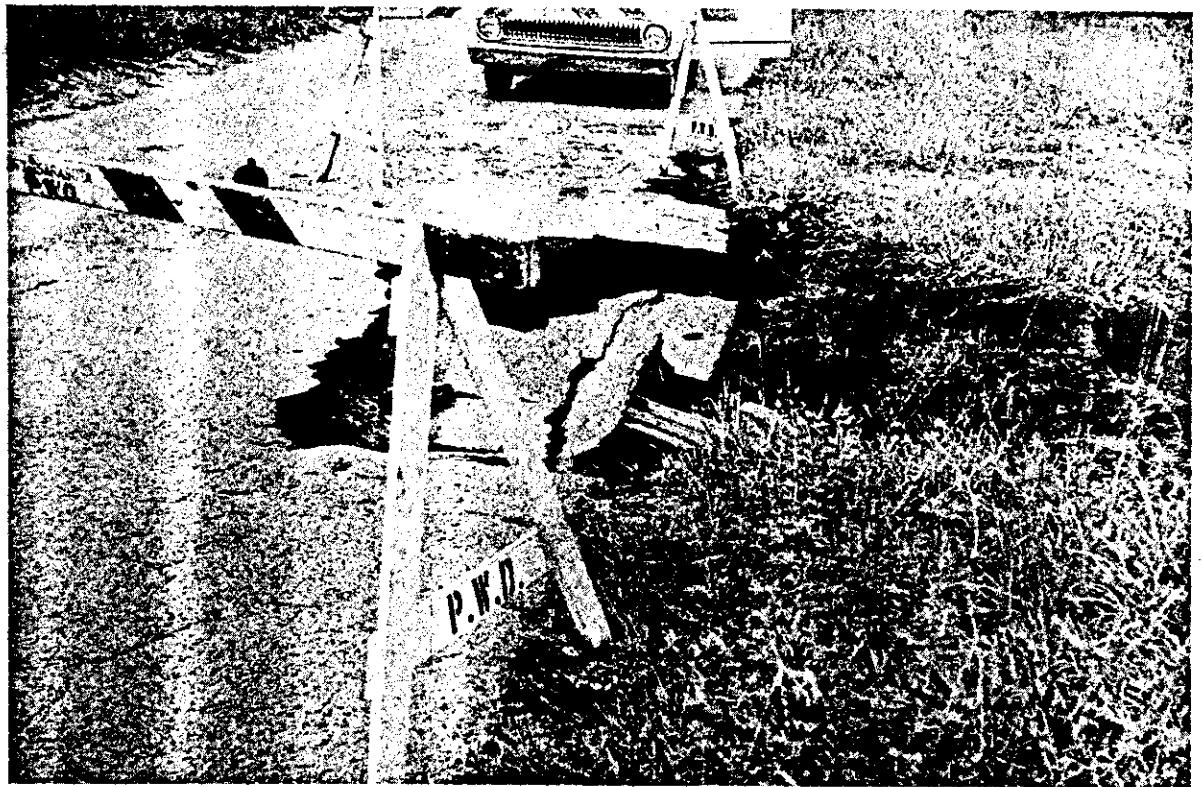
WASHOUT AT SMALL BRIDGE NEAR WEBBER STREET
